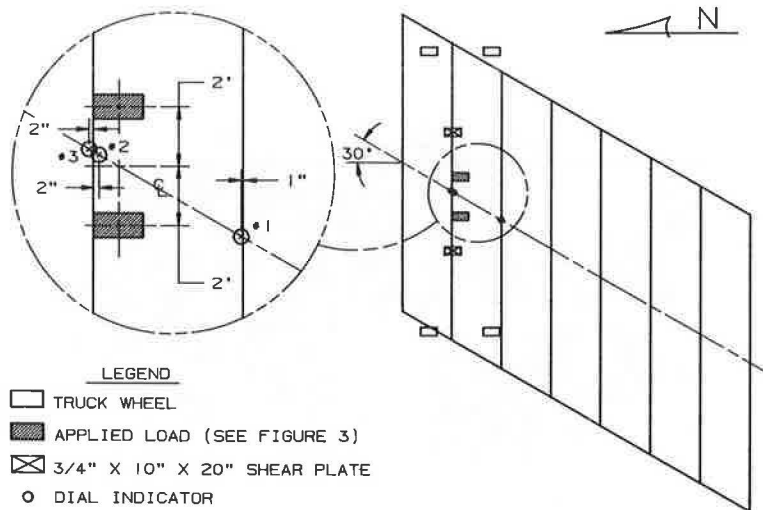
Load-deflection test arrangement for three-sided bridge.
